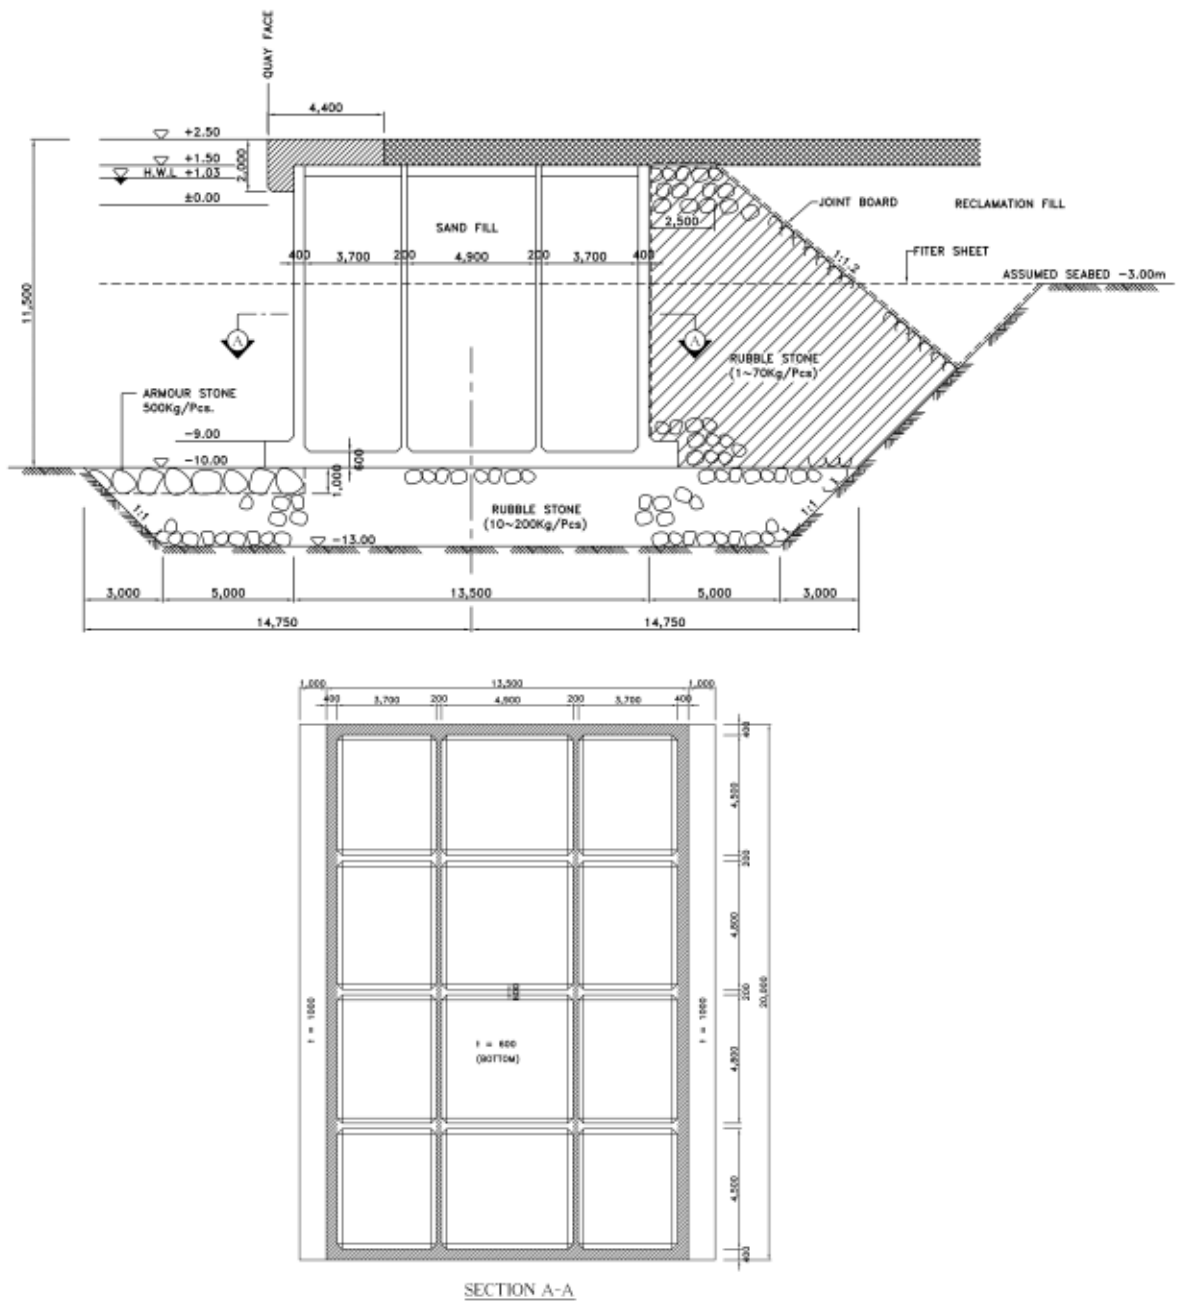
F-14 Typical Section of Caisson Type Multipurpose Berth of Bojonegara Port (Concrete Caisson, -10 m)
